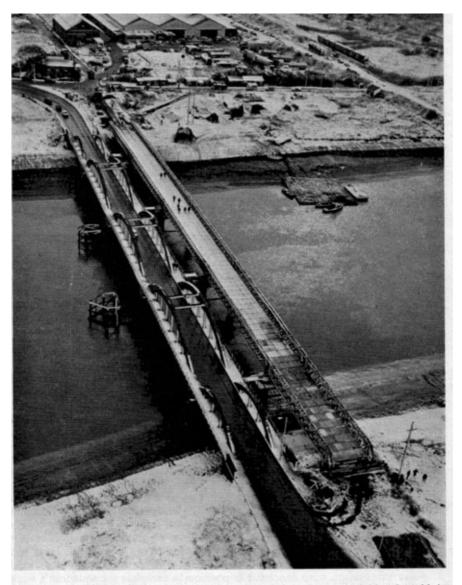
An aerial view of the bridge just prior to completion, with the Cut Bridge alongside it. *Photo courtesy of Eastern Counties Newspapers.
